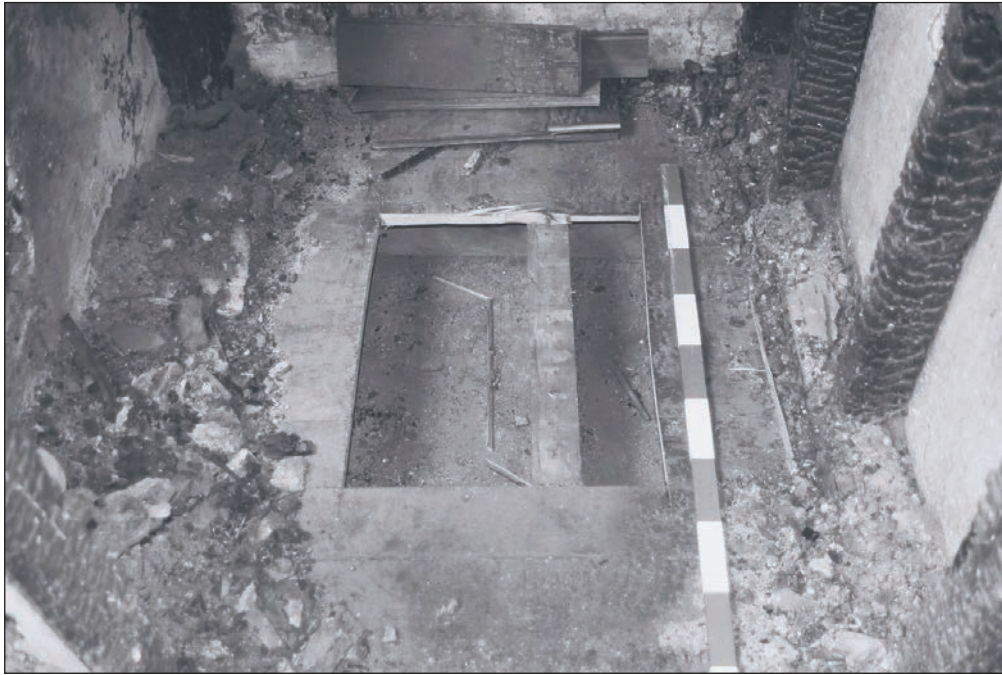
General view of lifted floor boards, Area 2, F3, Building 2 (Film 38.32)
